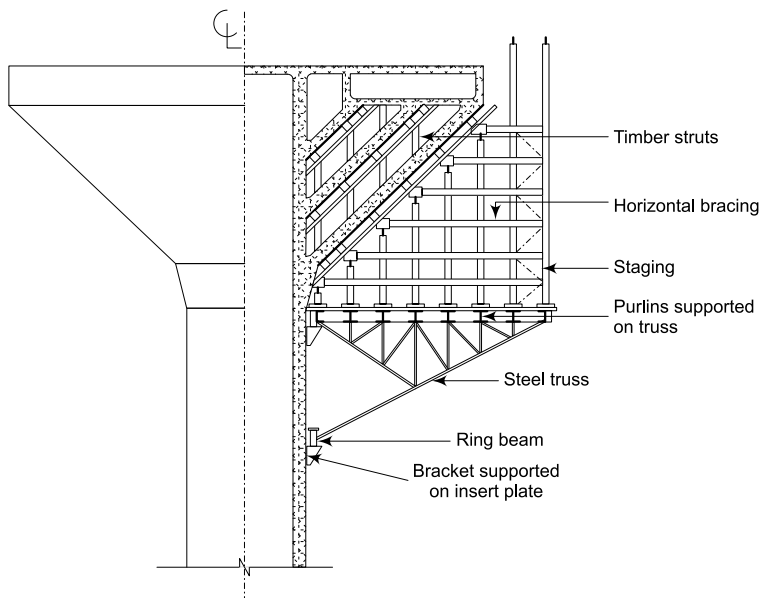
Formwork Arrangement for Overhead Water Tank.
